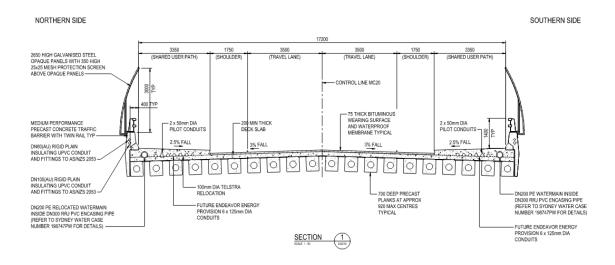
Proposed cross section on Lansdowne Road bridge during traffic stage 3
